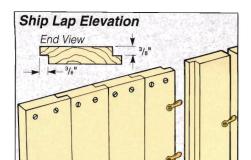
Make removable ship lapped boards for easy access to the wire connections.
